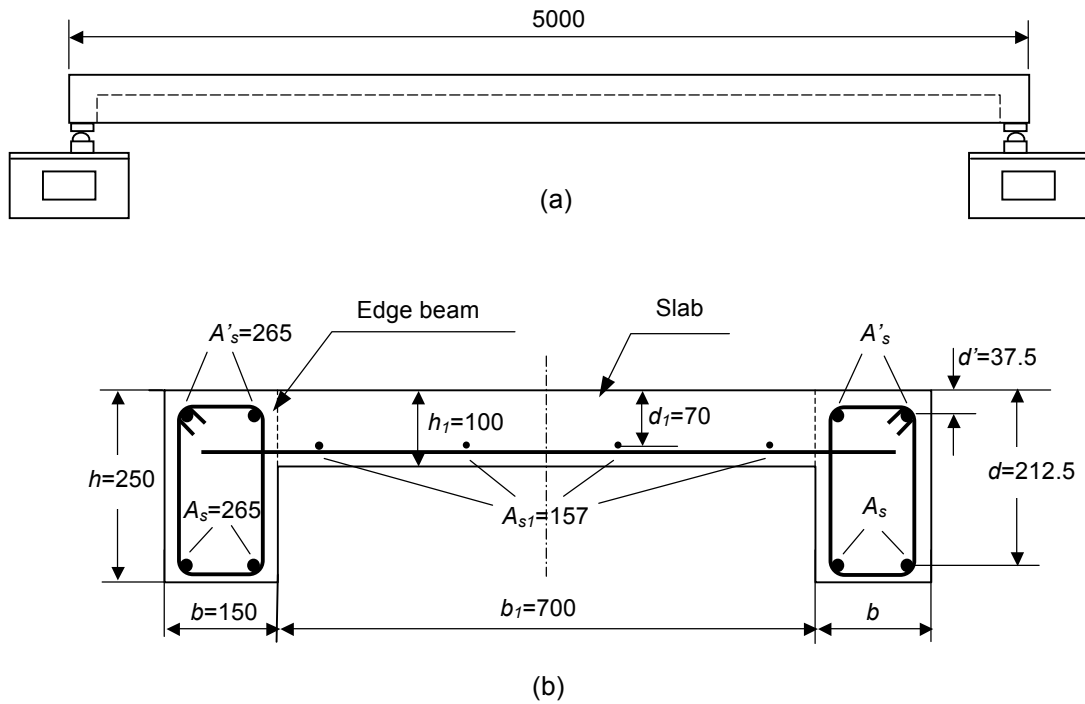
Schematic of Reinforced Concrete Bridge Deck
